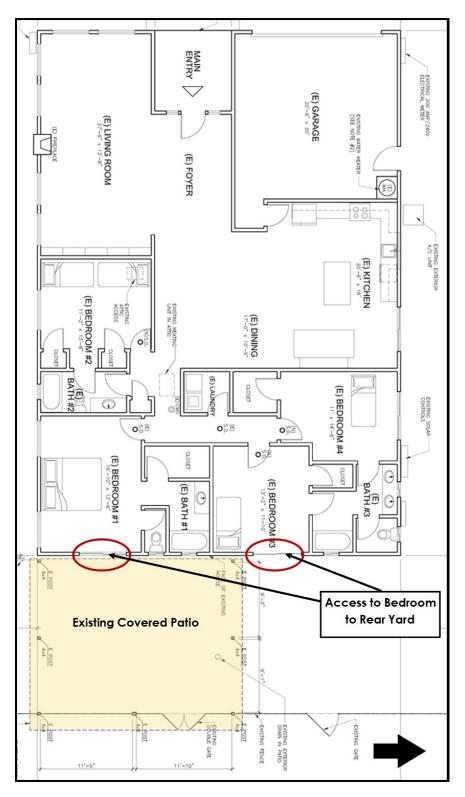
Exhibit C: EXISTING RESIDENCE FLOOR PLAN
